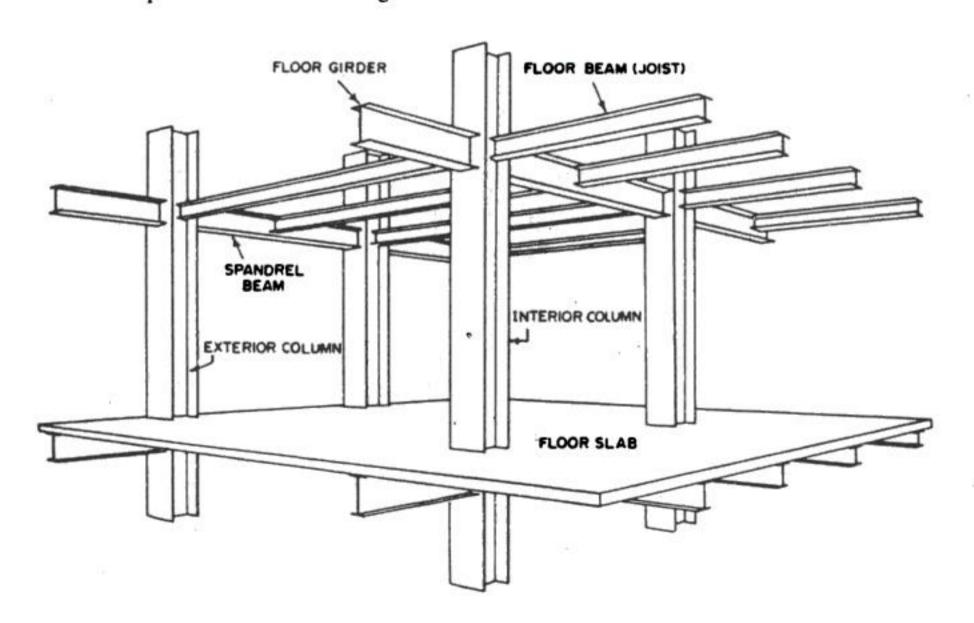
FRAMING FOR MULTISTOREYED BUILDING
